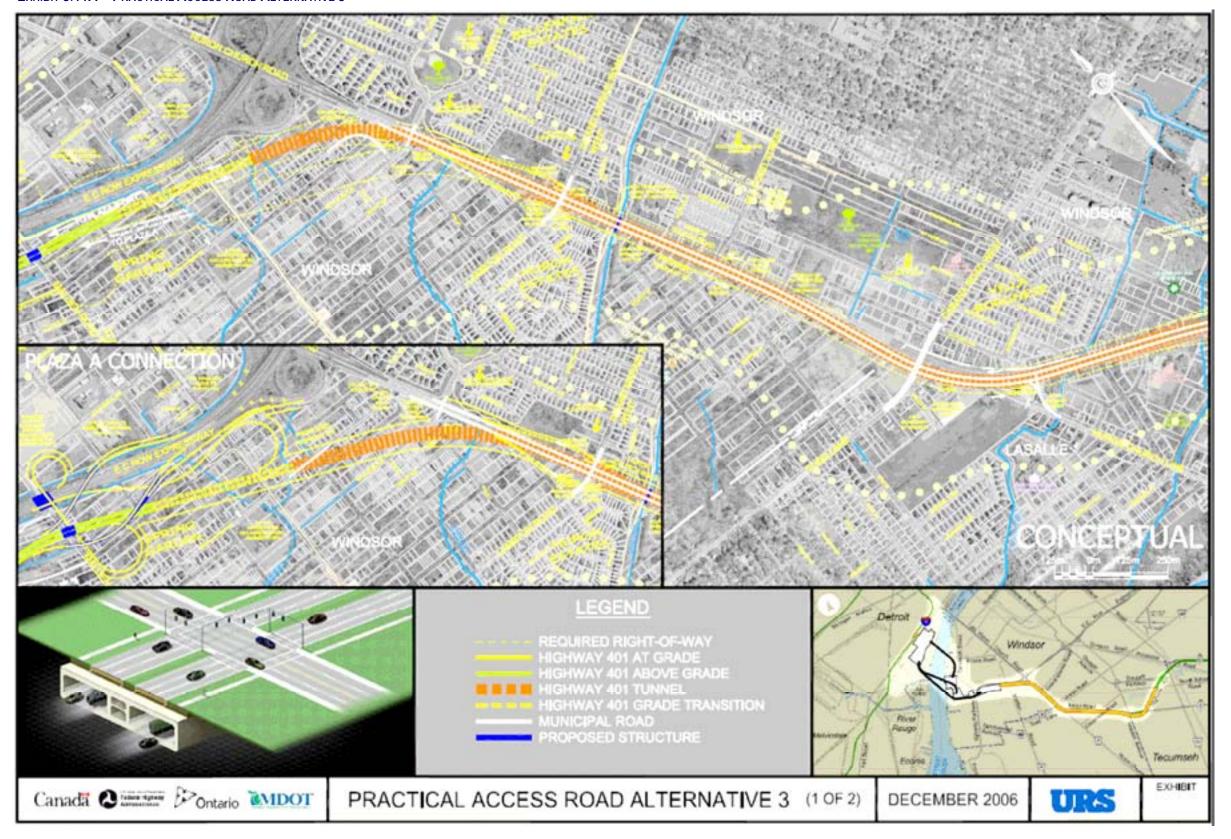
A – PRACTICAL ACCESS ROAD ALTERNATIVE 3
